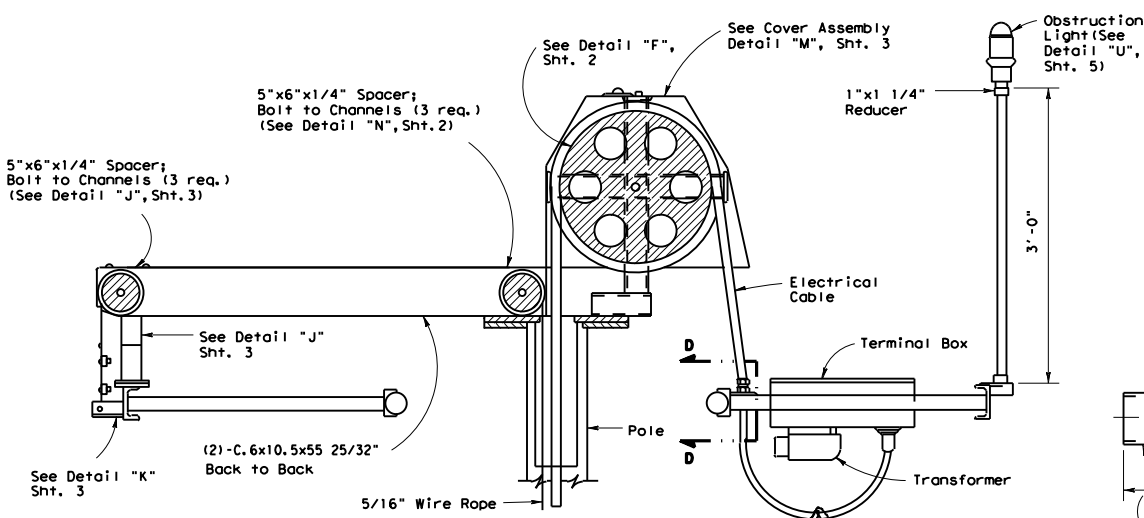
DETAIL 'E' CONDUIT ATTACHMENT FOR OBSTRUCTION LIGHTS, TYPICAL (3) PLACES
